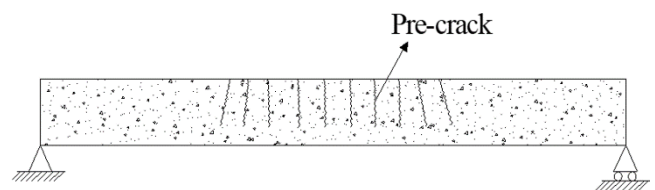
Pre-cracked reinforced concrete beam.
